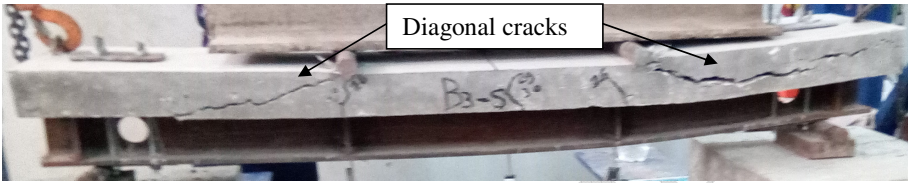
Typical shear failure for composite beams (loaded under two vertical)
